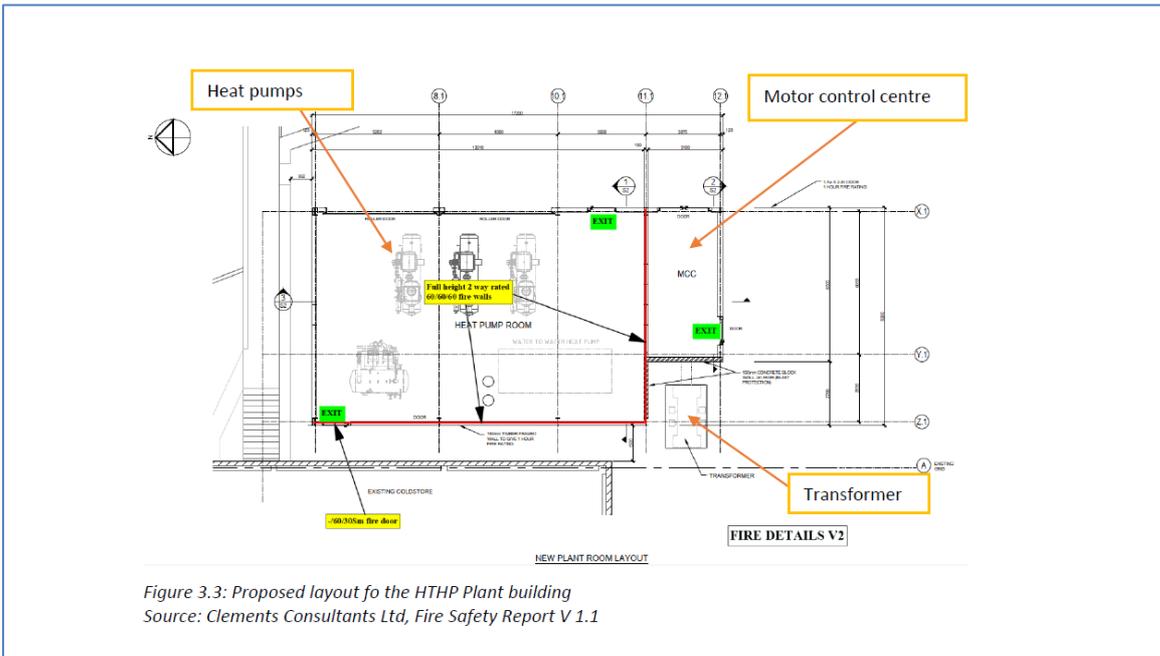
Proposed floor plan of HTHP Plant room including HTHP's and Transformer
